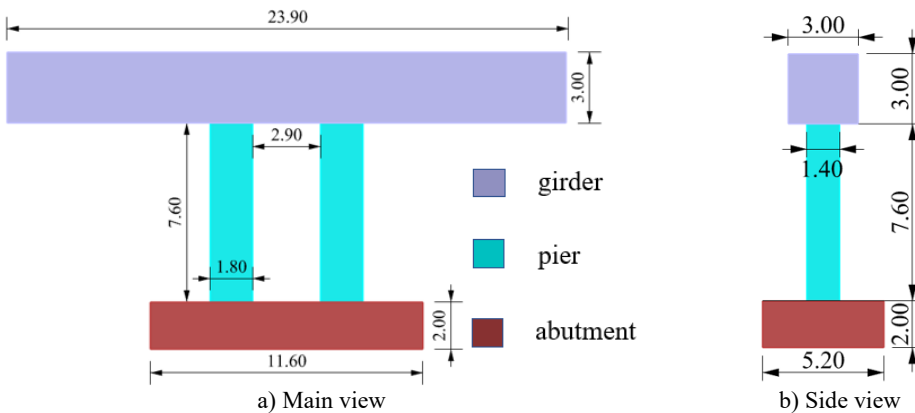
Dimensional detail of precast prefabricated pier (unit: m)
